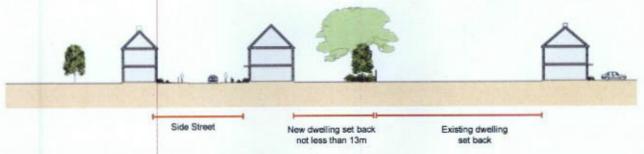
Section 2: Boundary treatment with existing 2 storey dwelling back garden on Oxford Road
